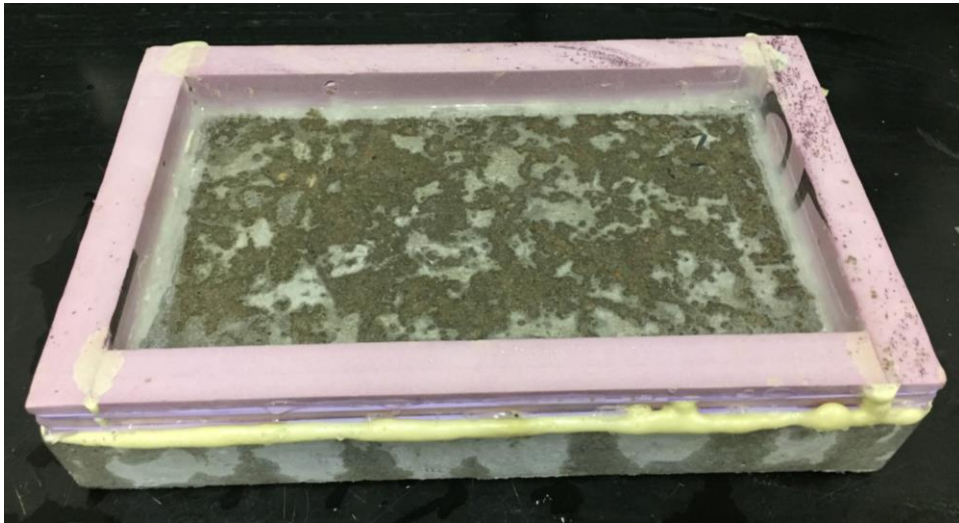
Mix 1-100 Salt Scaling Specimen at 50 Cycles
